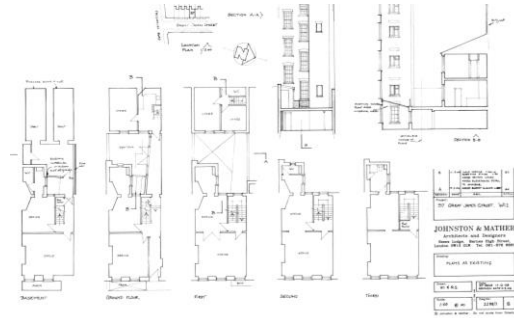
Existing 2004 plans (ref: 2004/0158/) which shows double door opening in the spine wall at second floor level.
